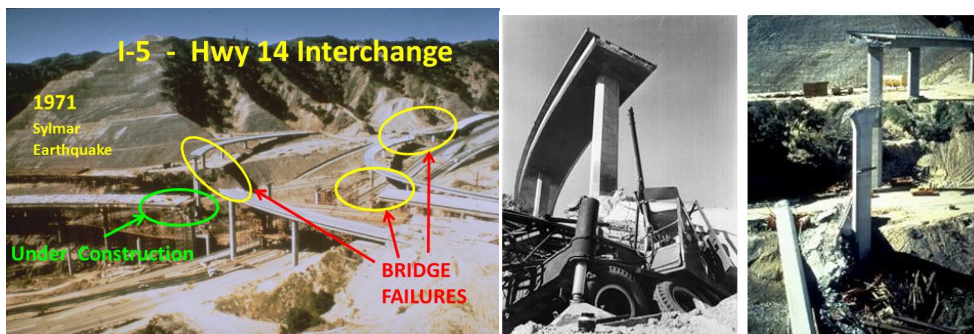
1971 Sylmar Earthquake Bridge Failures on I-5– State Road 14 Interchange
